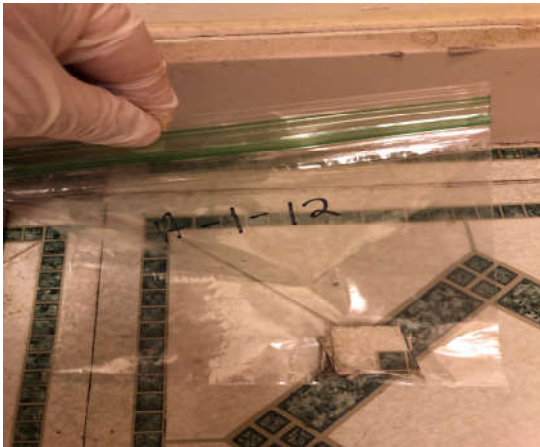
View of VFT in 1st floor restroom in building #1 at 2824 N. Nevada.
